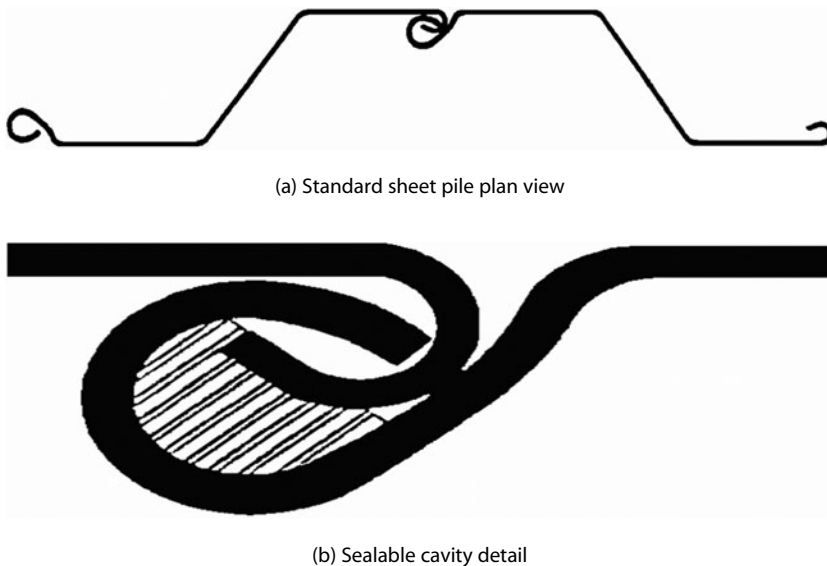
The Waterloo Barrier Steel Sheet Piling System.
